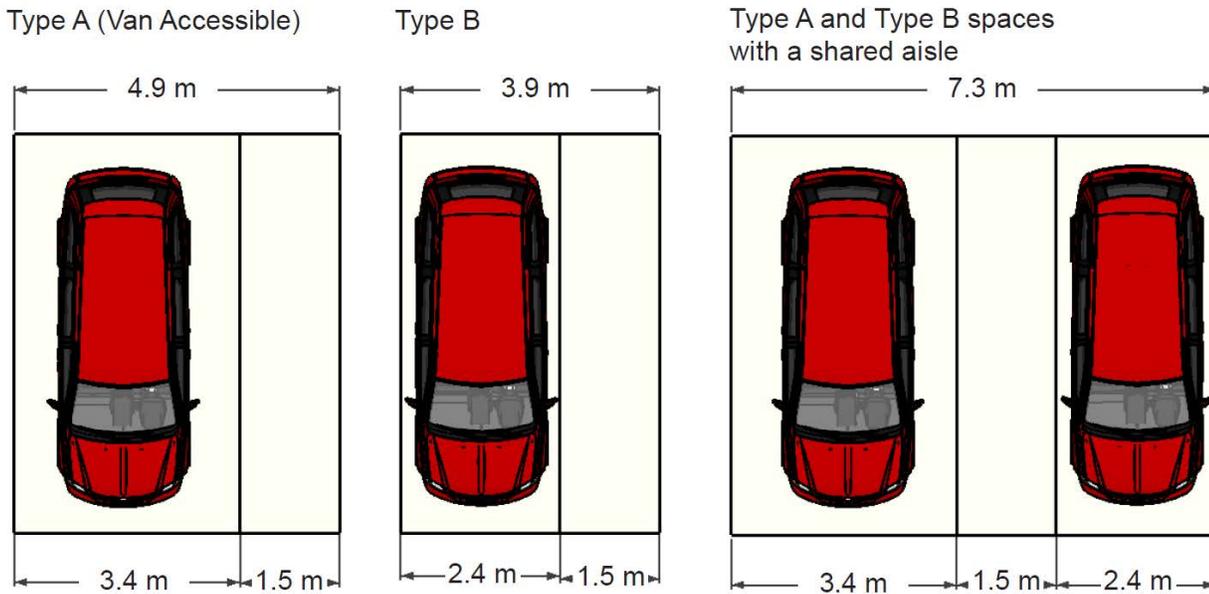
Current Zoning Requirements for Accessible Parking Space Dimensions
